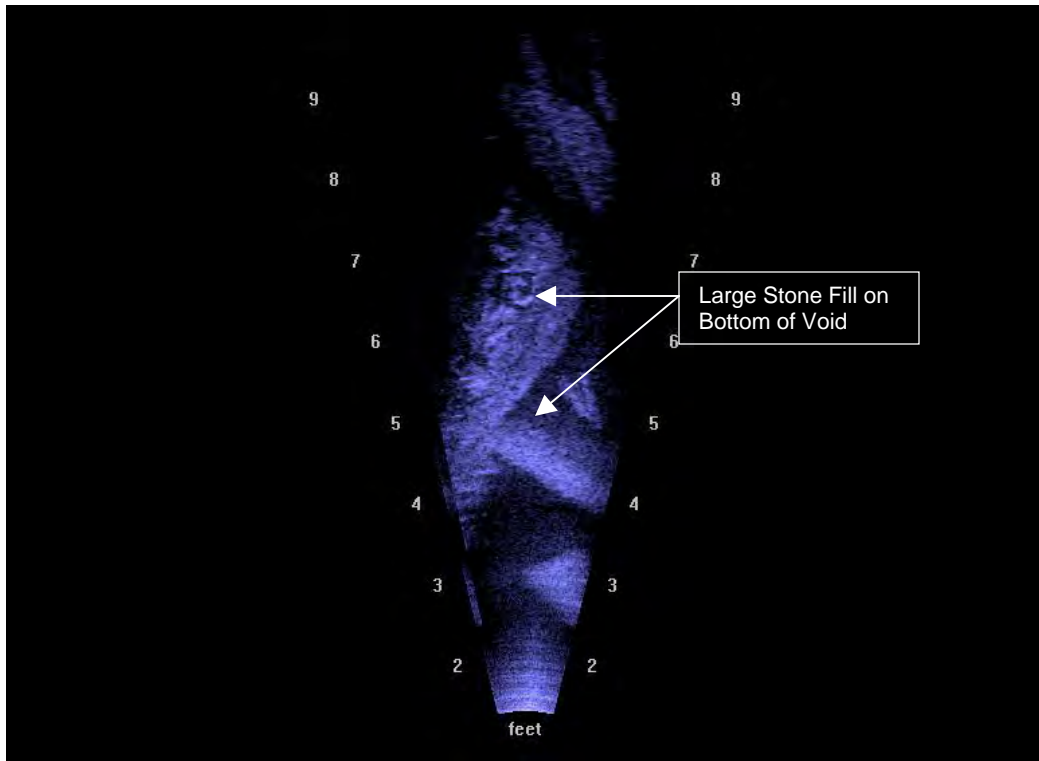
Pier 2, west face, south end, sonar image from interior of the void showing large stone fill.
